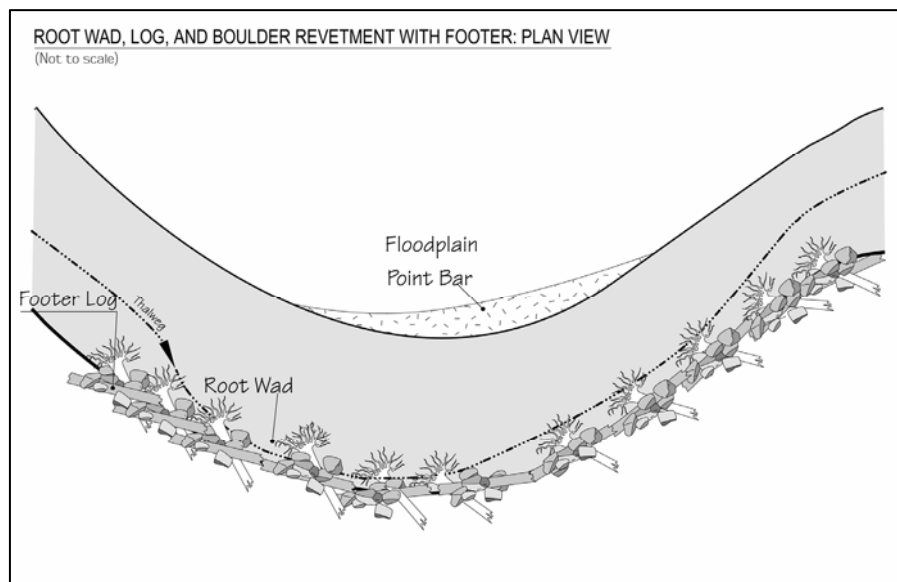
Rootwad, Log, and Boulder Revetment with Footer: Plan View
